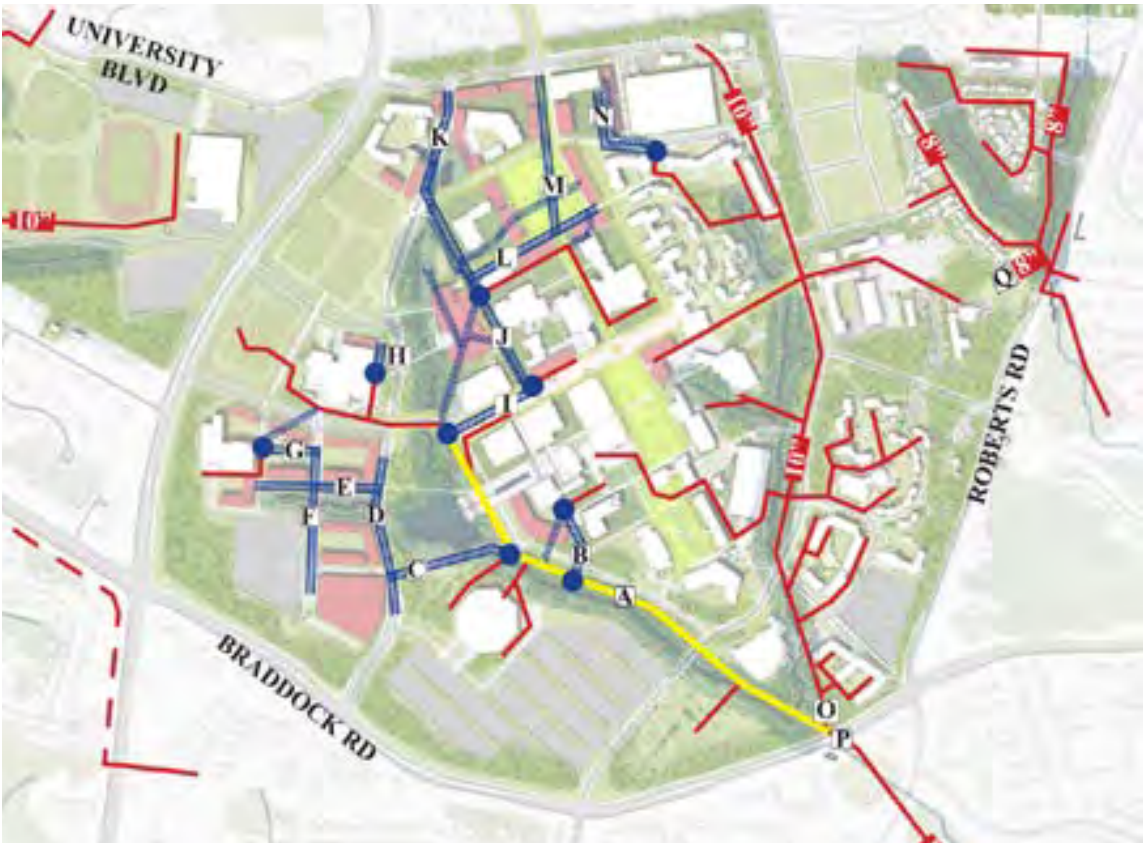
Proposed Sanitary Sewer Improvements at Fairfax Campus
